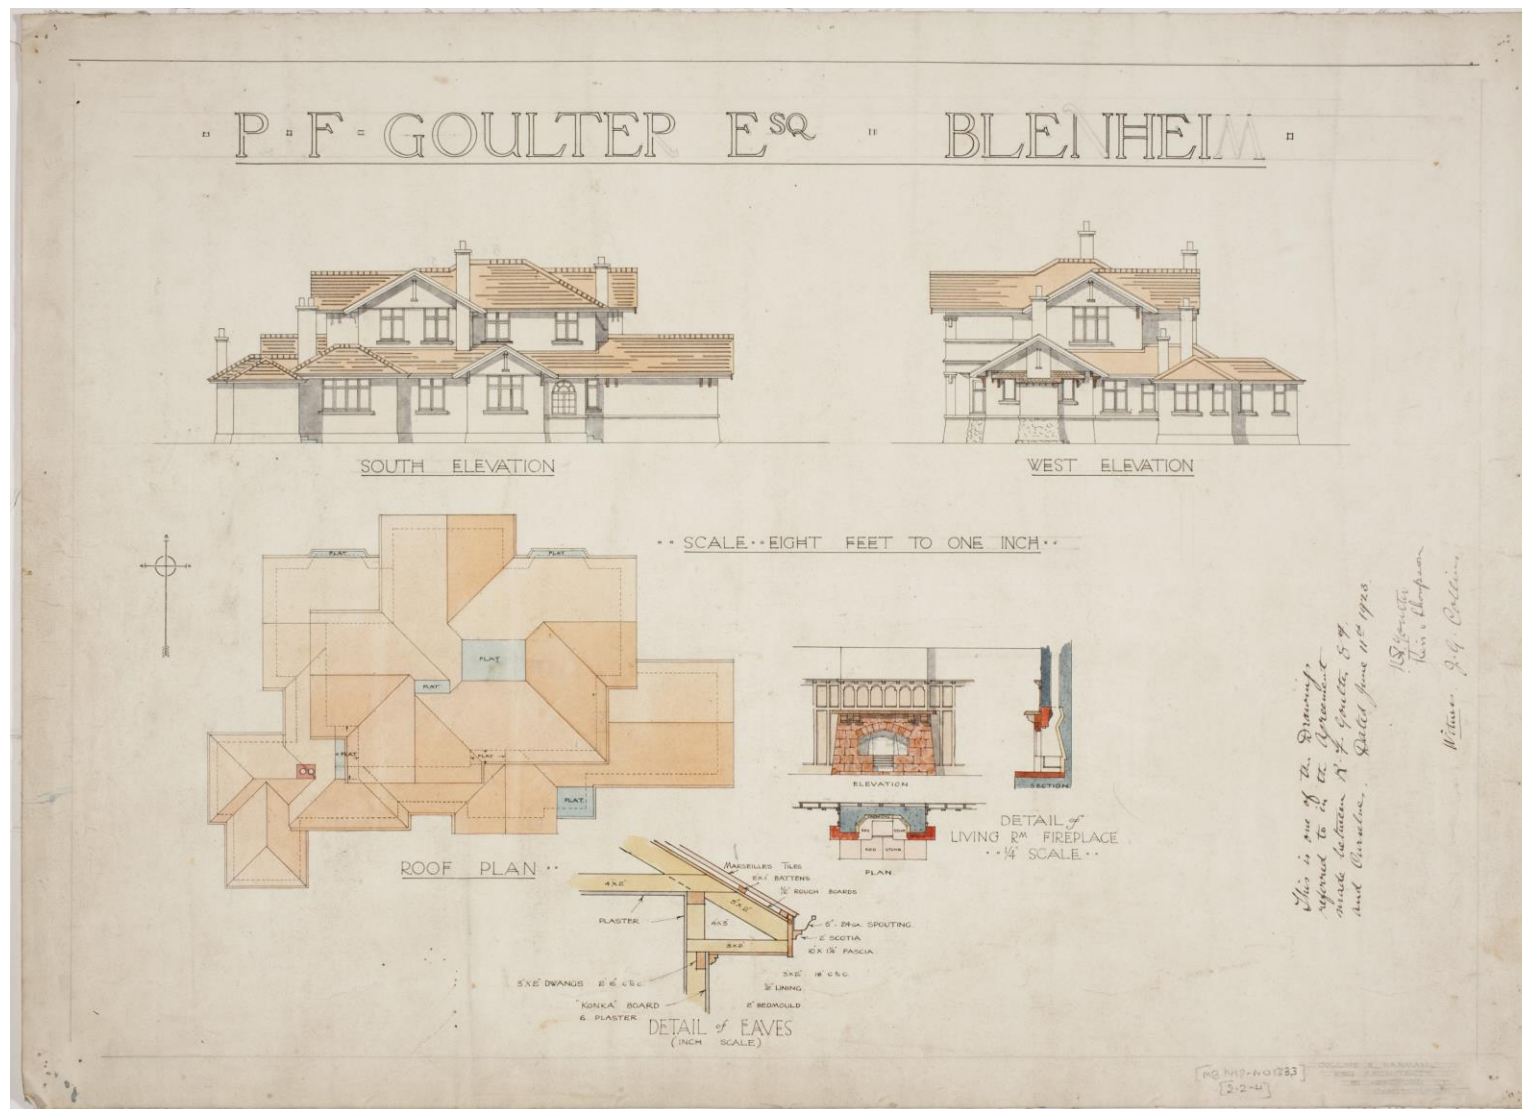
Collins and Harman, R. F. Goulter, Esq., Blenheim, plan, elevations and details (1923).
